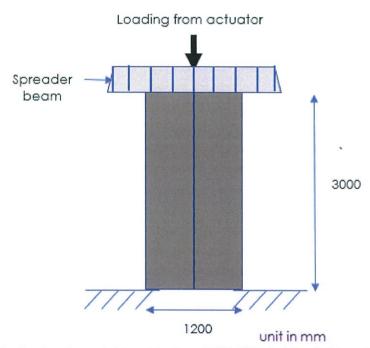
Test setup for axial load test on GEG ECO lightweight wall panel
